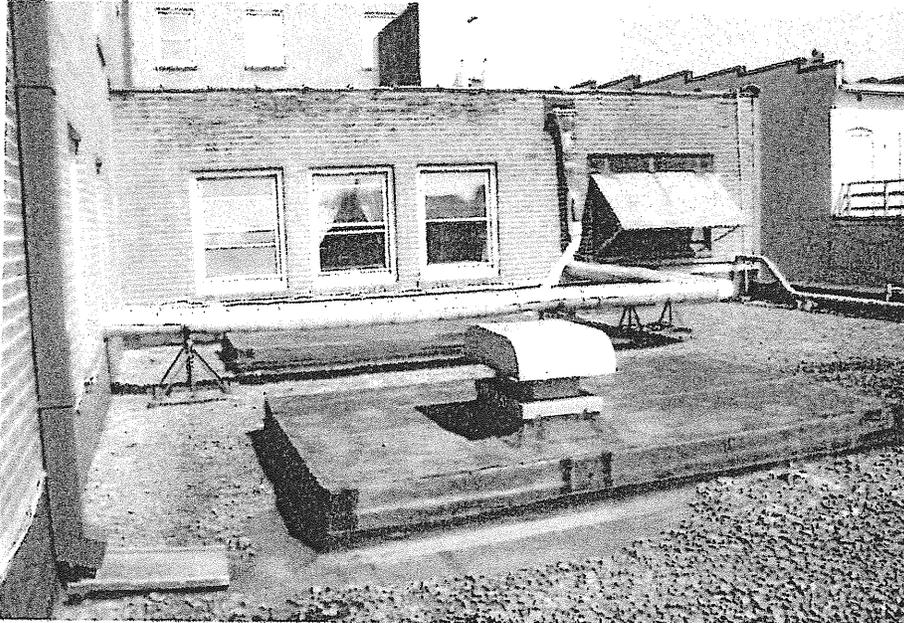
Partial view of roof-top mechanical equipment on second story roof.
